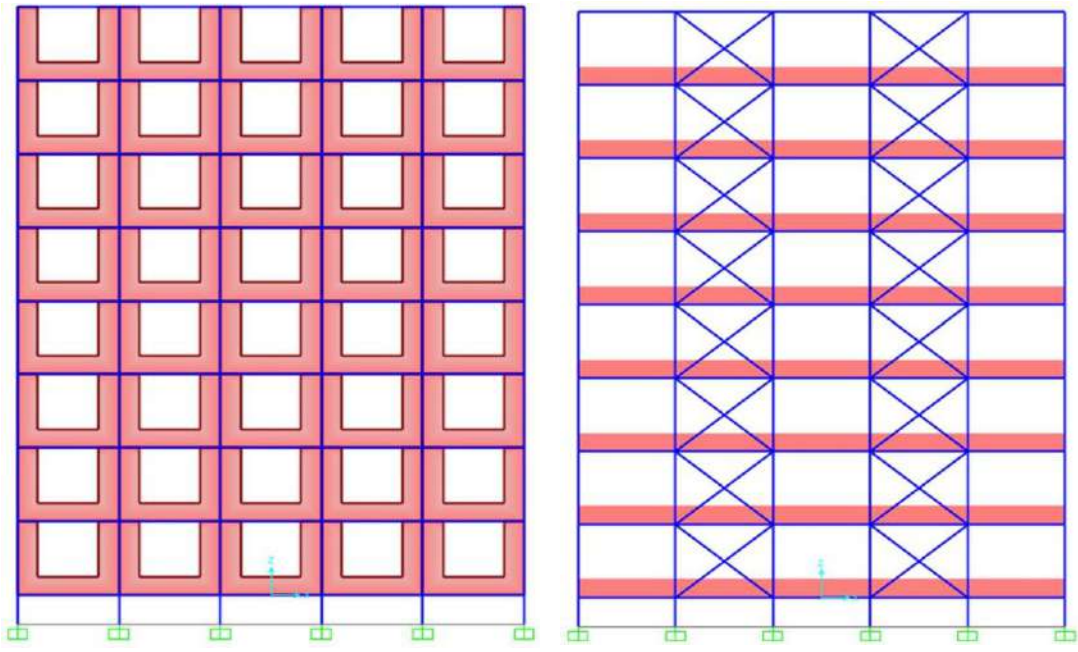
Elevation of 25% Partially in-filled frame with additional in-fills adjoining the column
